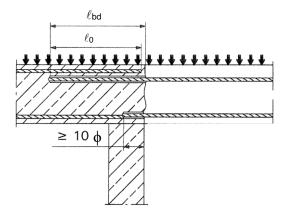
End anchoring of slabs or beams (e.g. designed as simply supported)
